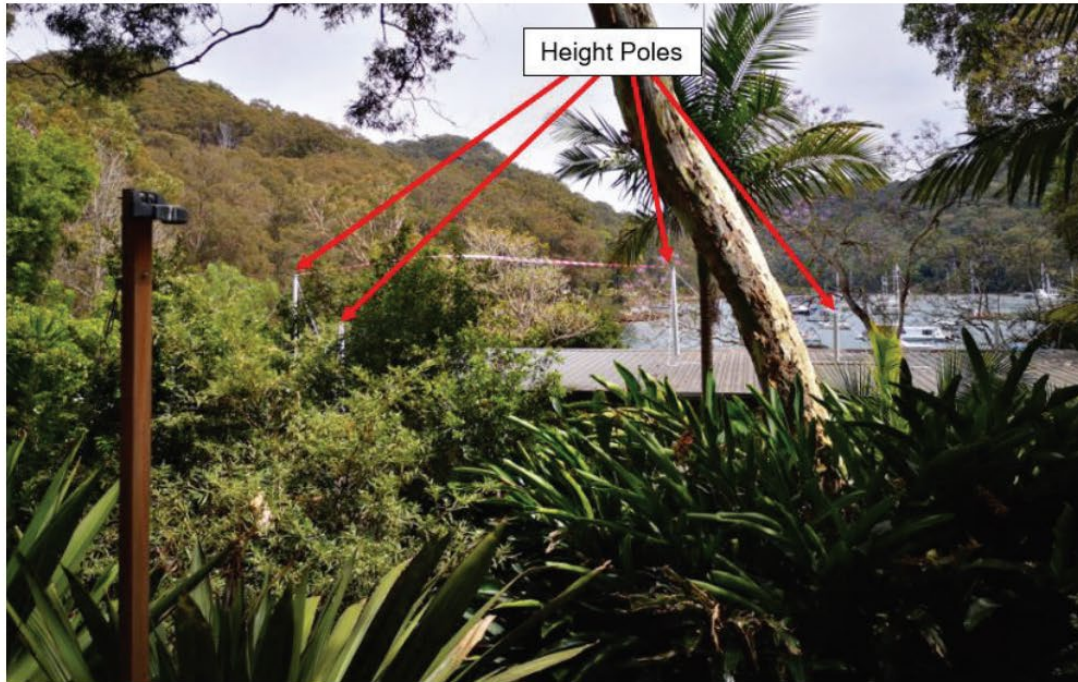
Existing views from No.32 Sturdee Lane to the north-west (rear garden deck). Height pole indicates extent of view loss from initial proposal (amended plans subsequently received which reduced overall height of the proposed dwelling)
